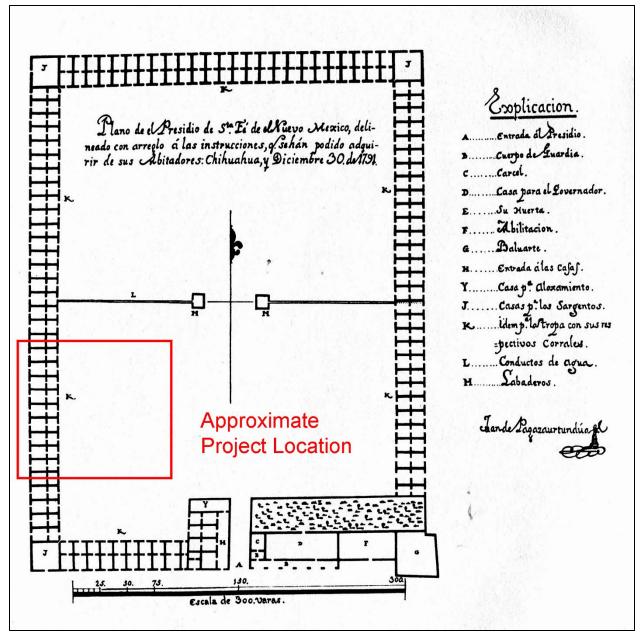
1791 Plan of the Santa Fe Presidio.
